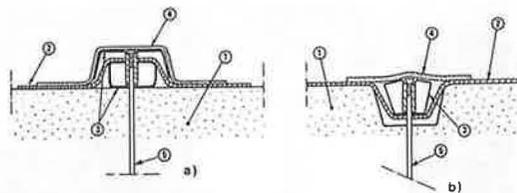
Horizontal Sections through Steel Rib Fastening System
